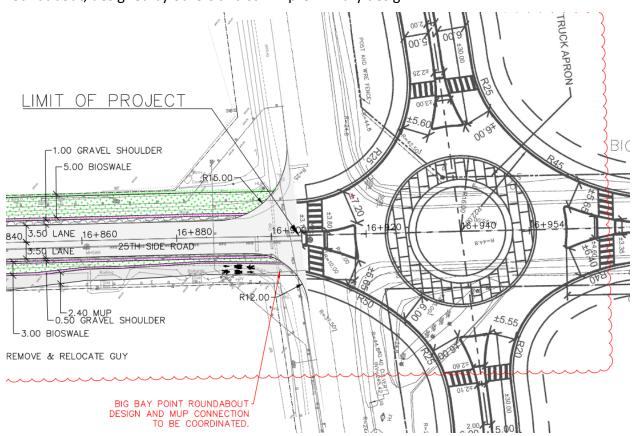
The proposed conceptual design for the roundabout at 25th Side Road and Big Bay Point / 13th Line
